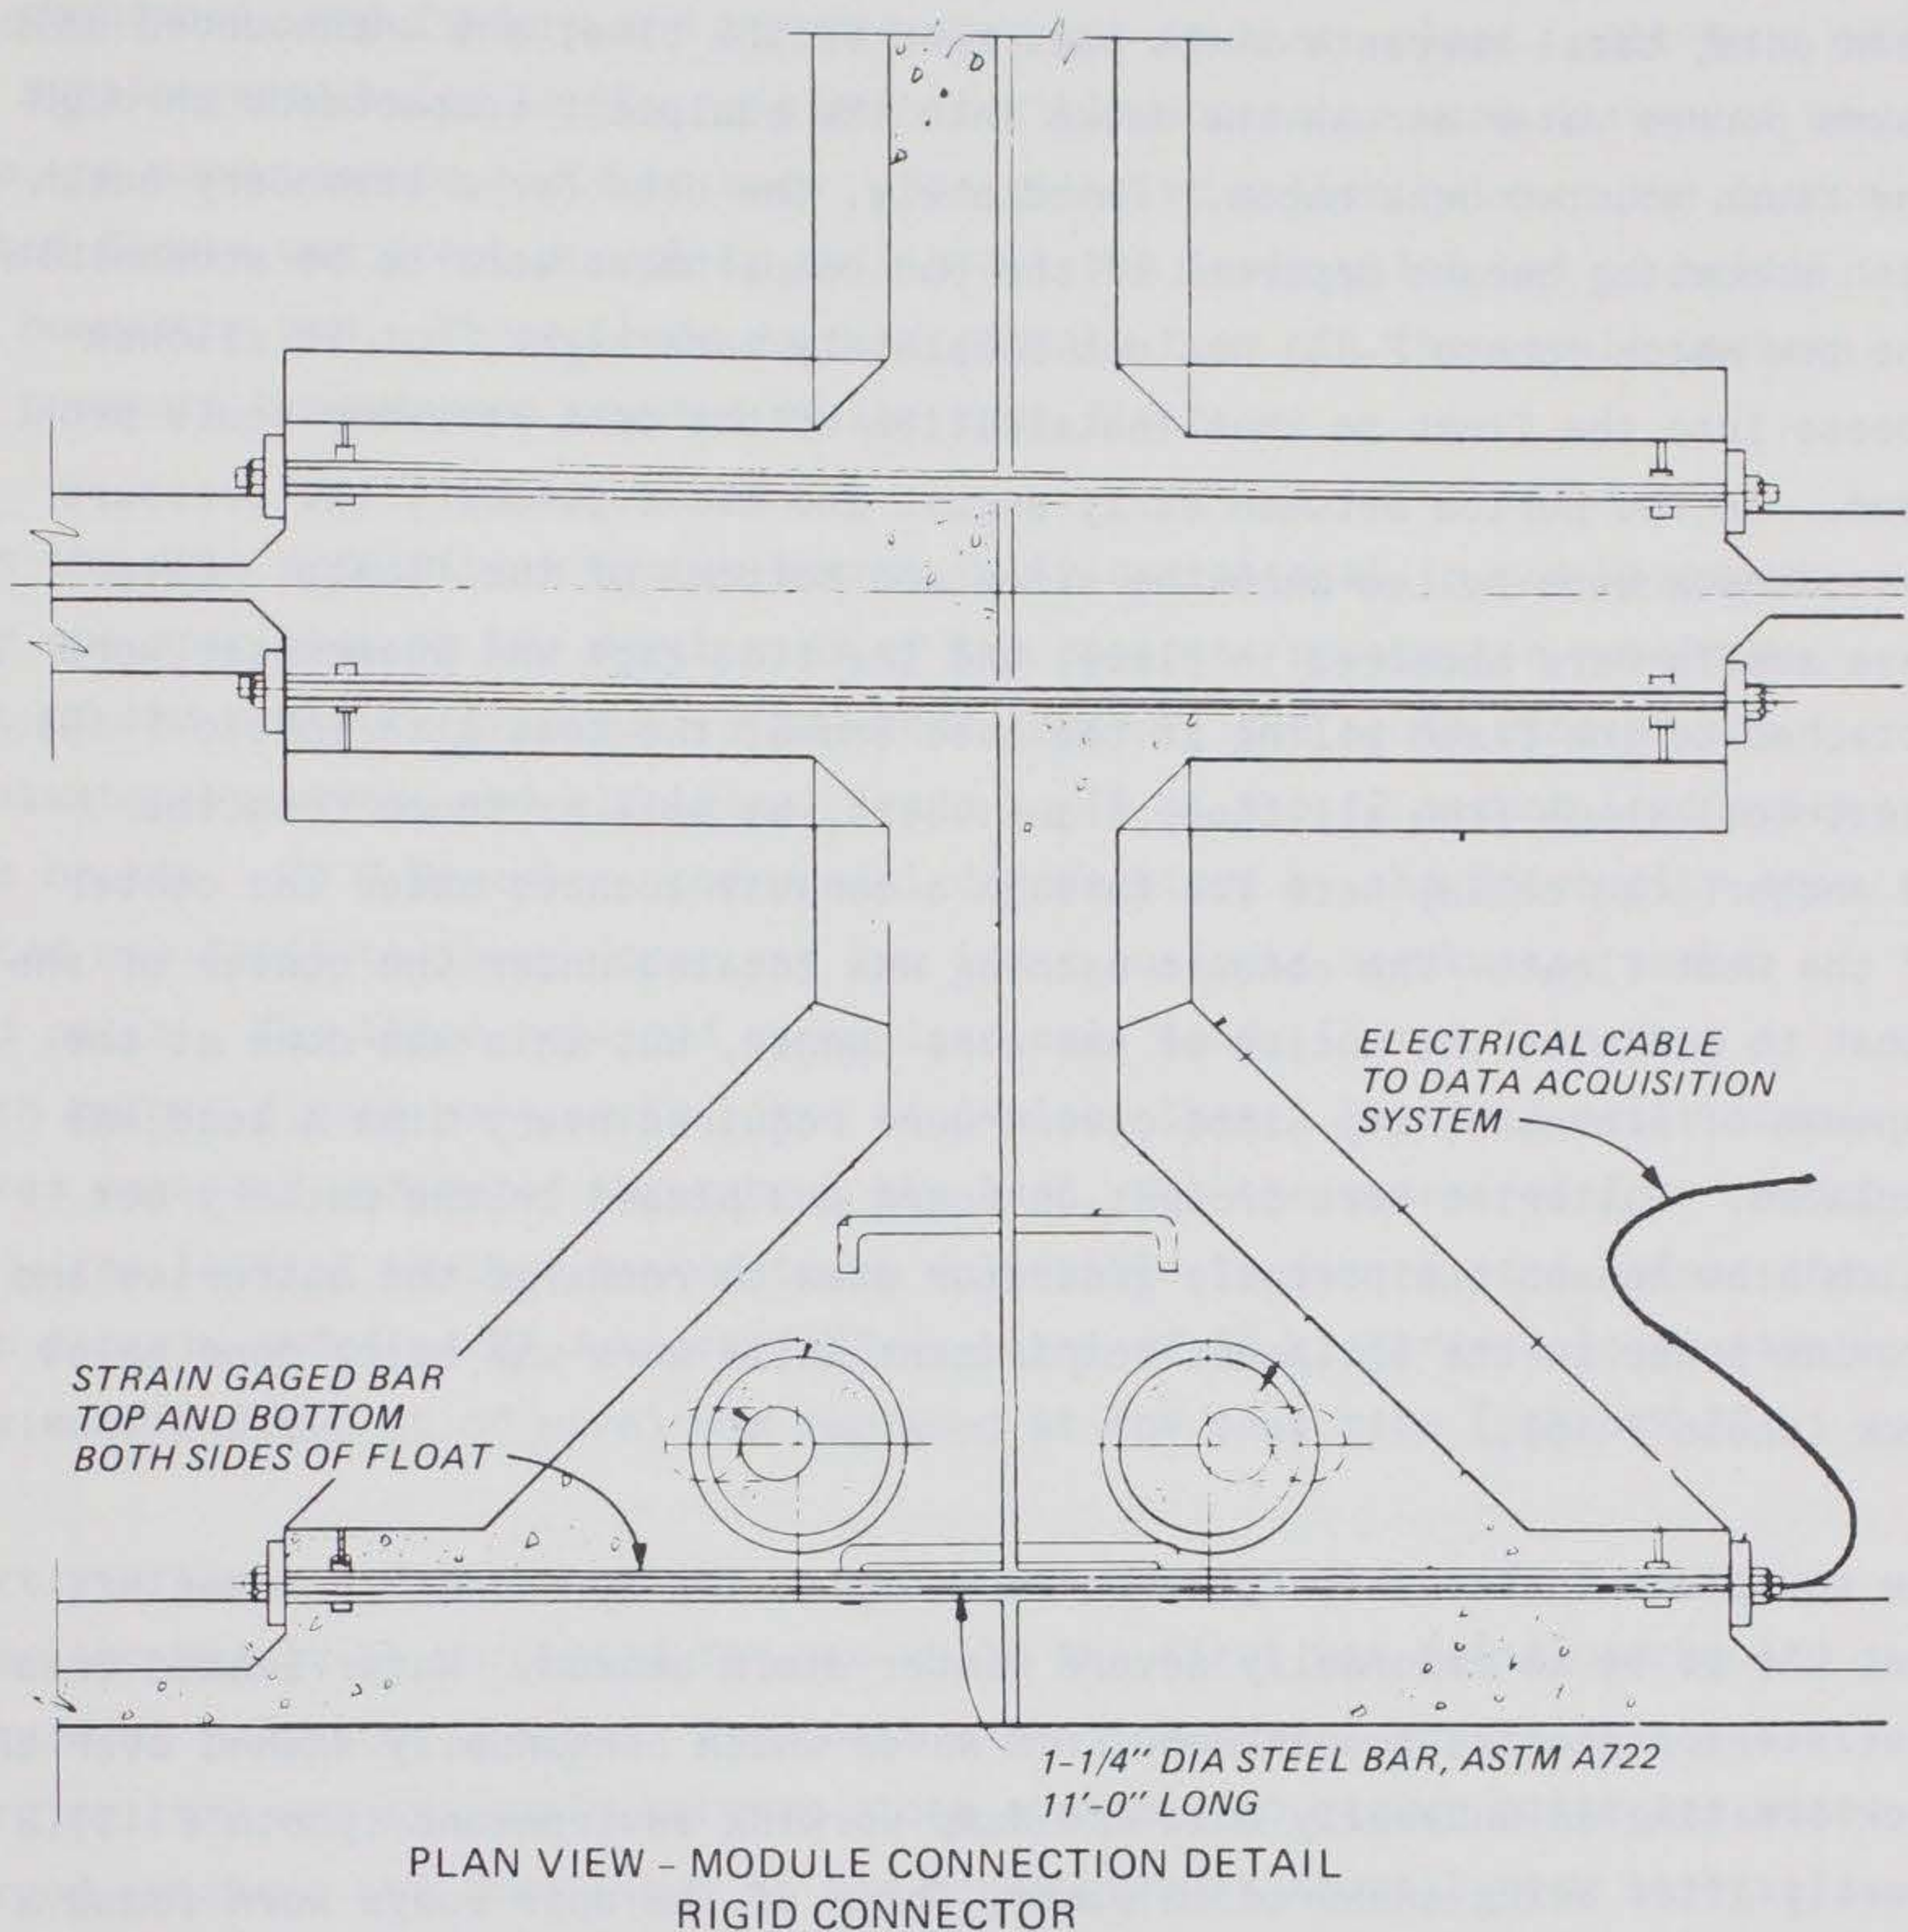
Rigid Connector, Load Sensing Bolt (Bar) Locations
